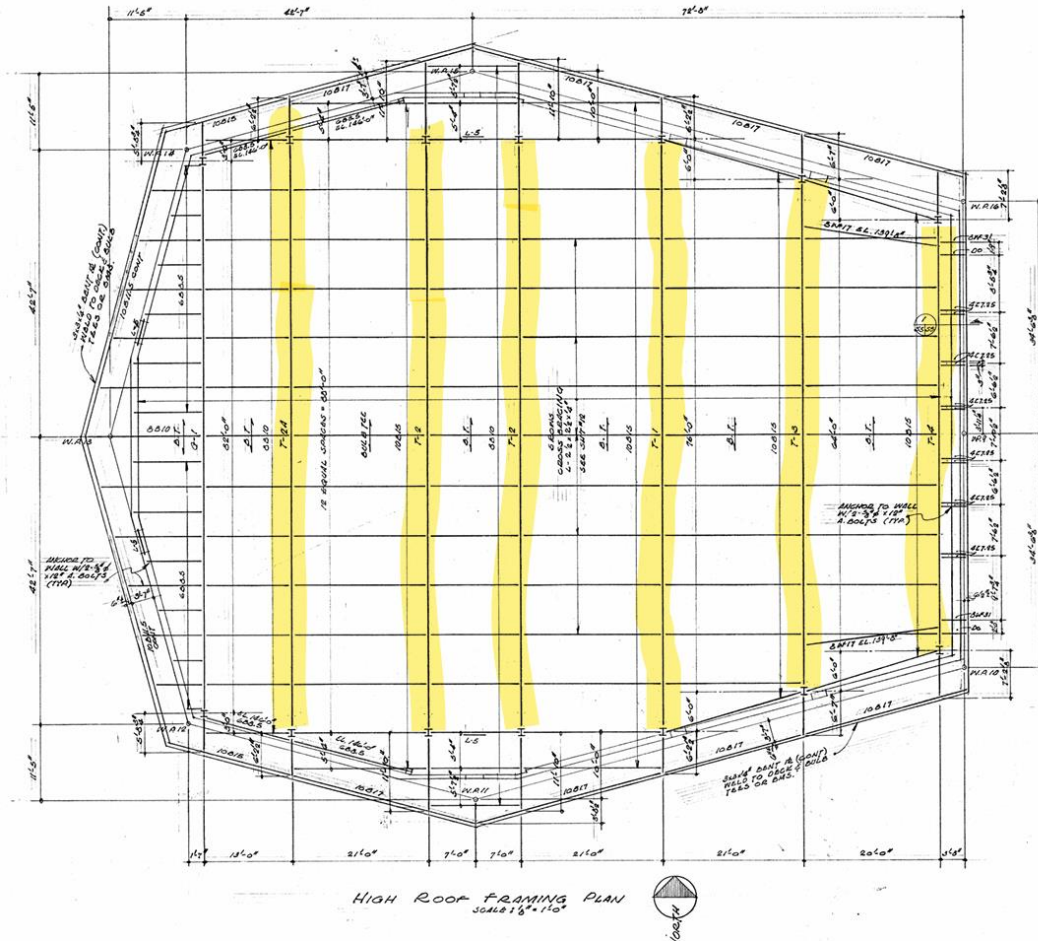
Roof 4 of the CFAC with Trusses Highlighted.
